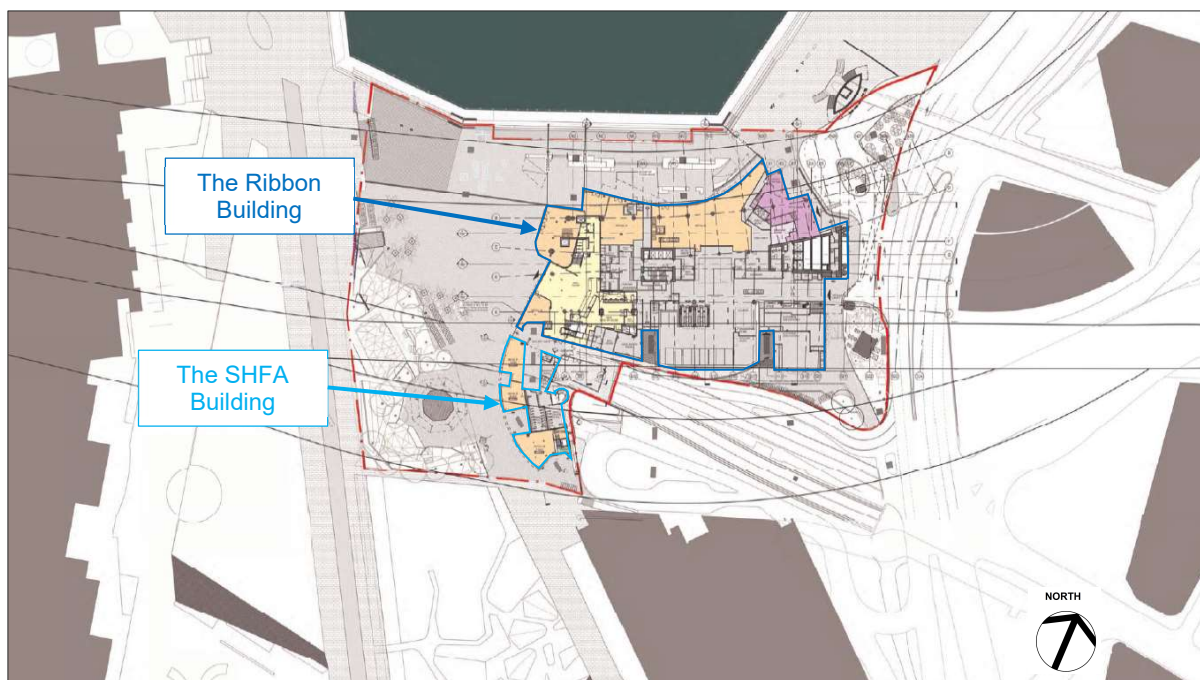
| Site Boundary and The Ribbon (Base image source: Mod 10 stamped plans)
